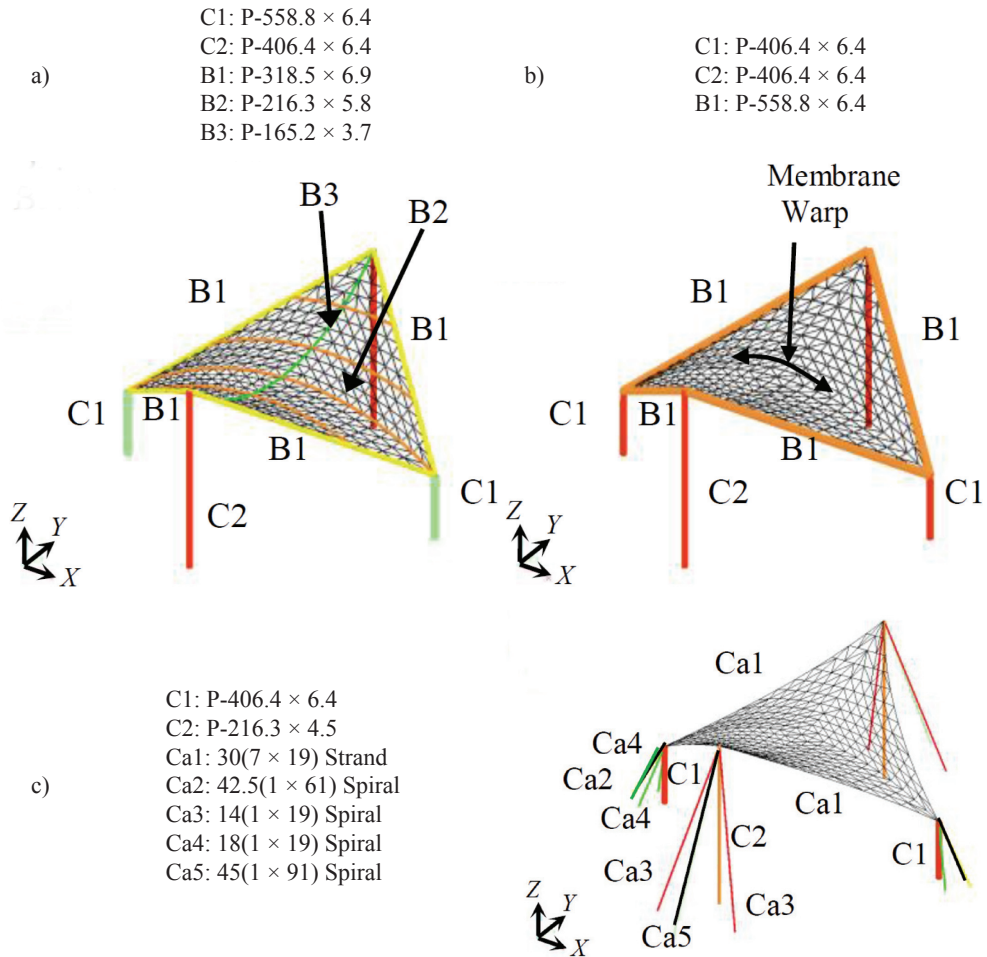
HP-shaped roof structural models, a) frame type 1 (F1), b) frame type 2 (F2), c) suspension type (S1)
